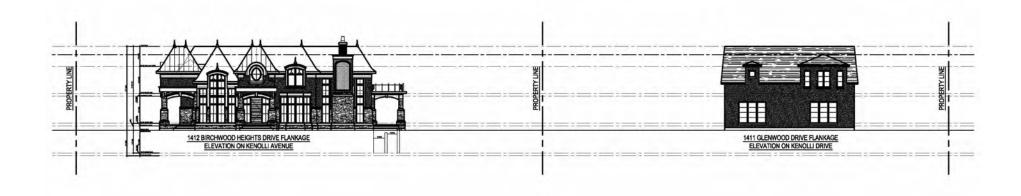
PROPOSED DEVELOPMENT - Kenollie Avenue streetscape.
